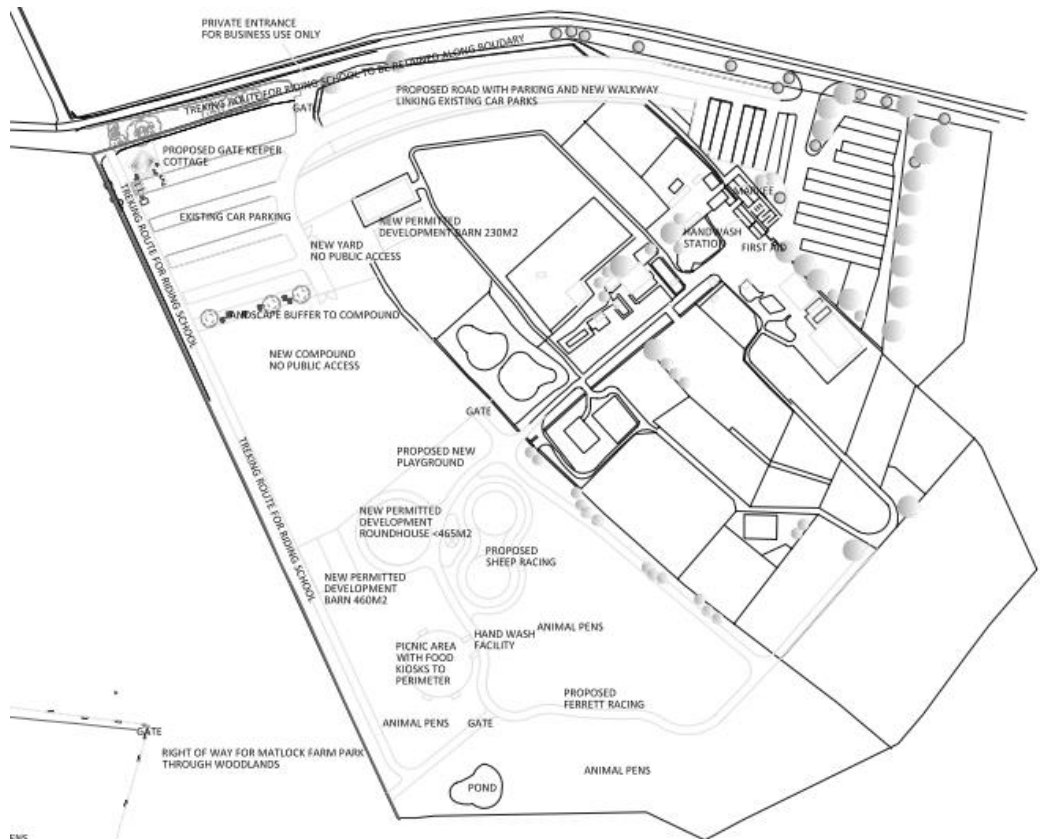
Proposed site plan with proposed managers dwelling in the north west corner of the site
